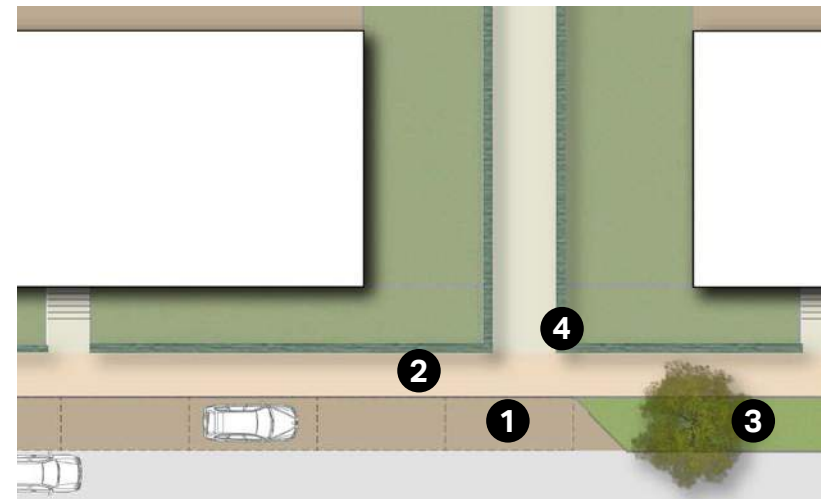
Illustrative diagram showing an indicative layout of on-street inset parking.
